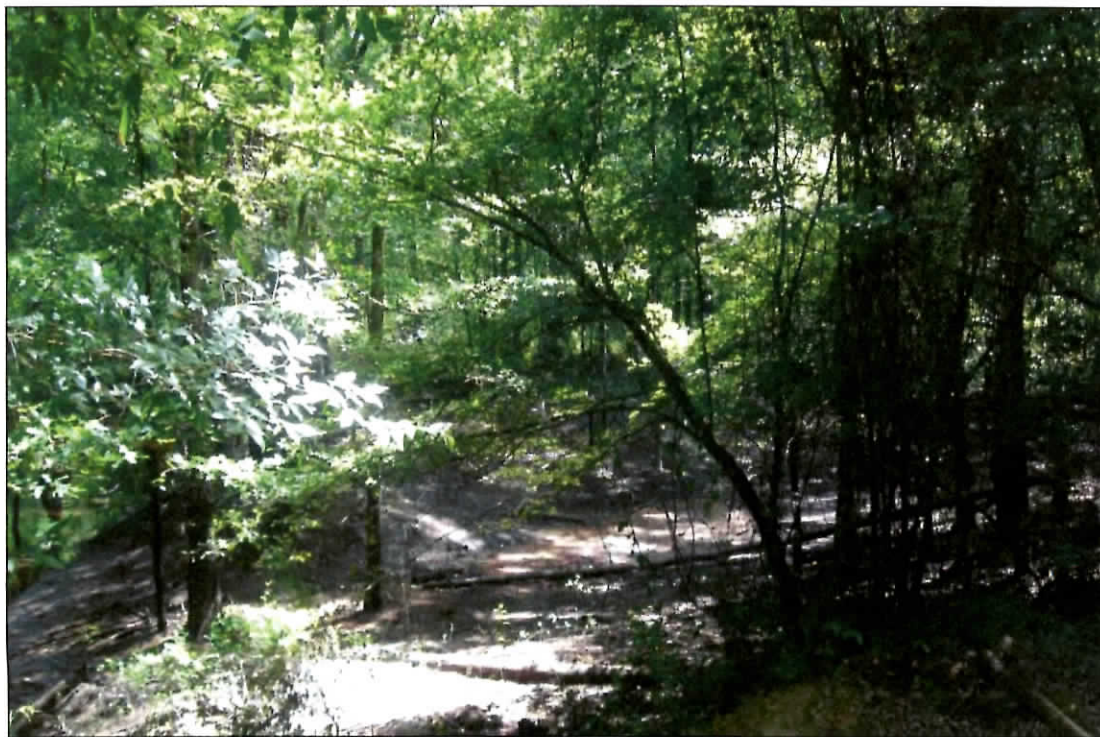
A view showing the existing bridge and the pipelines which currently extend over Bayou Dorcheat.
